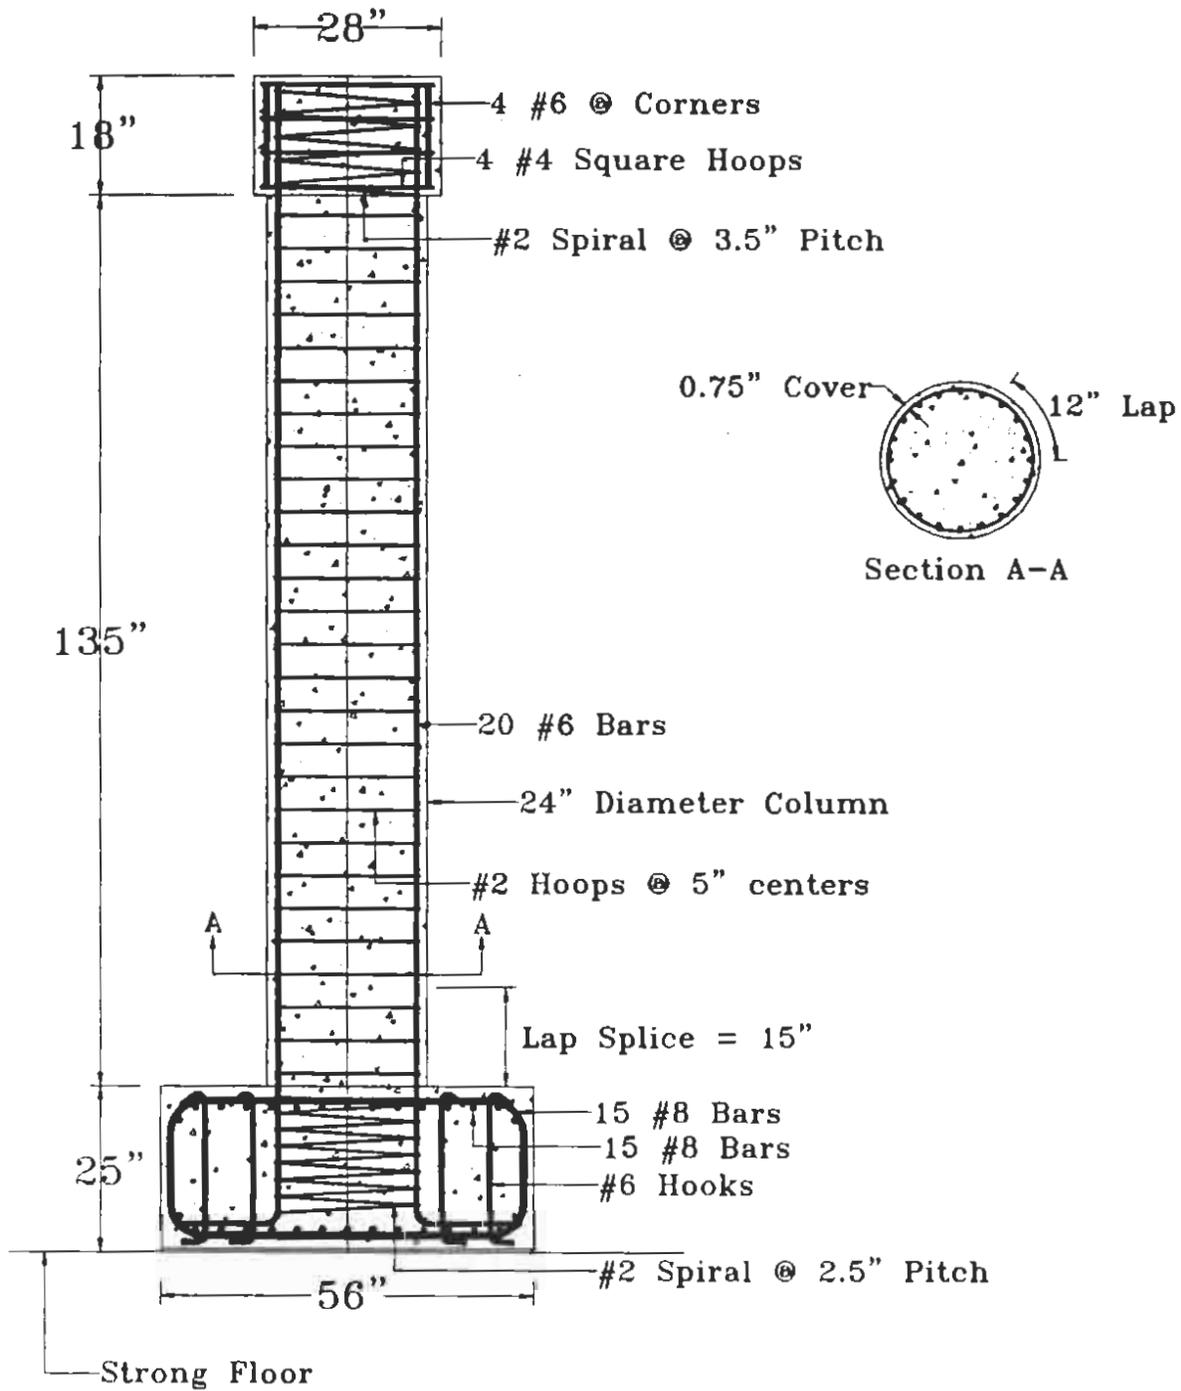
Reinforcement Details for Lap Splice Enhancement Circular Columns
